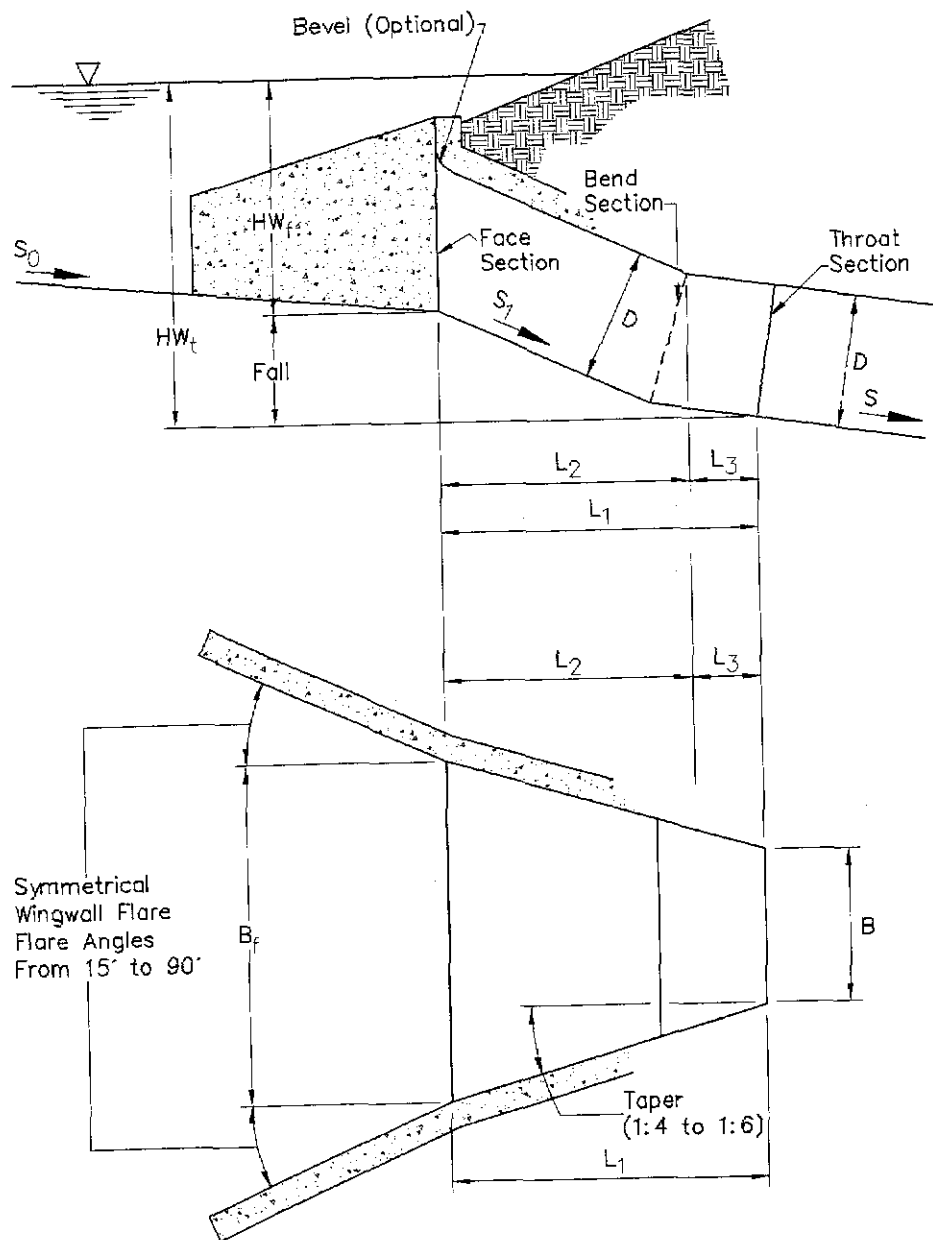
Slope-Tapered Inlet with Vertical Walls
